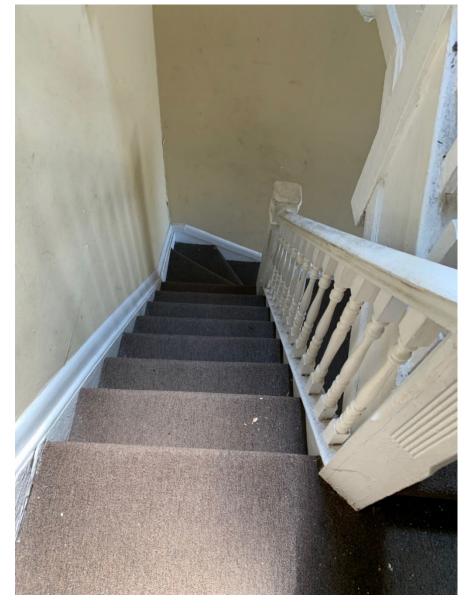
Narrow Stair Leading to the Second Floor from the First Floor
